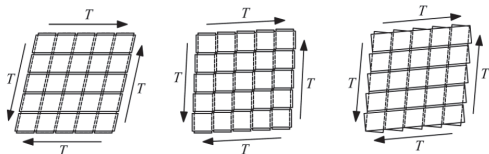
Failure modes I, II and III in CLT beams subjected to transversal forces in plane direction (from left to right) [6]
